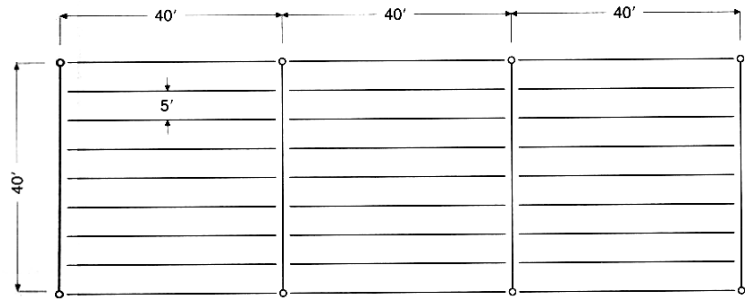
Framing plan for joists, girders, and columns on 40 ft x 40 ft grid.
